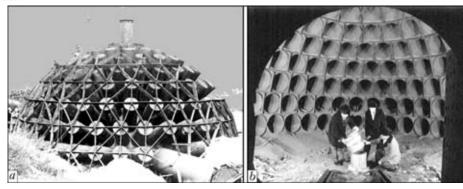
Tubular explosion chamber for 200 kg of explosive (Glevakha): a - view during construction; b - inside view
